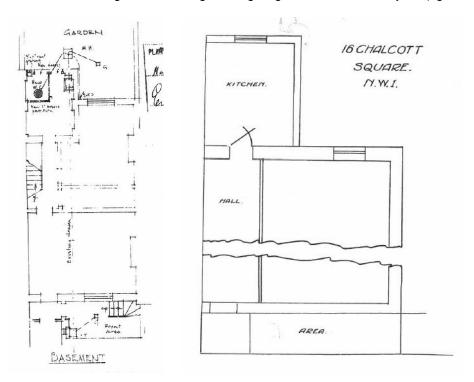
Drainage plans of 1935 (L) and 1938 (R)
